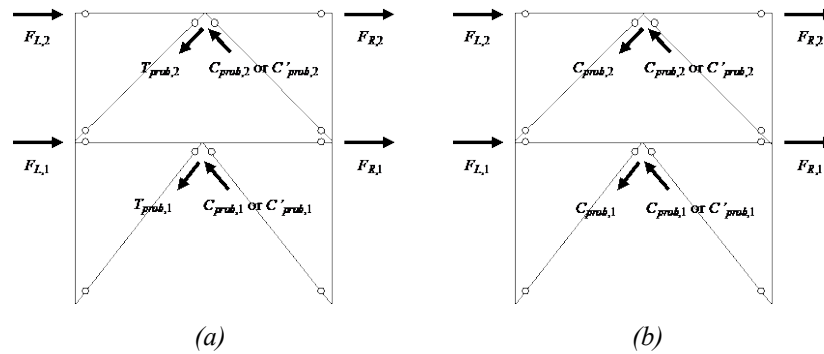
Brace forces on the beam in IV-CBFs considered in design: (a) current S16-19 approach; (b) alternative approach.
